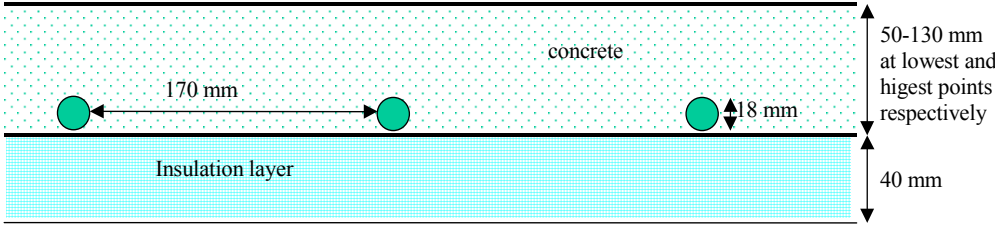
Cross-section of floor cooling with heat exchange pipes in room 2.
